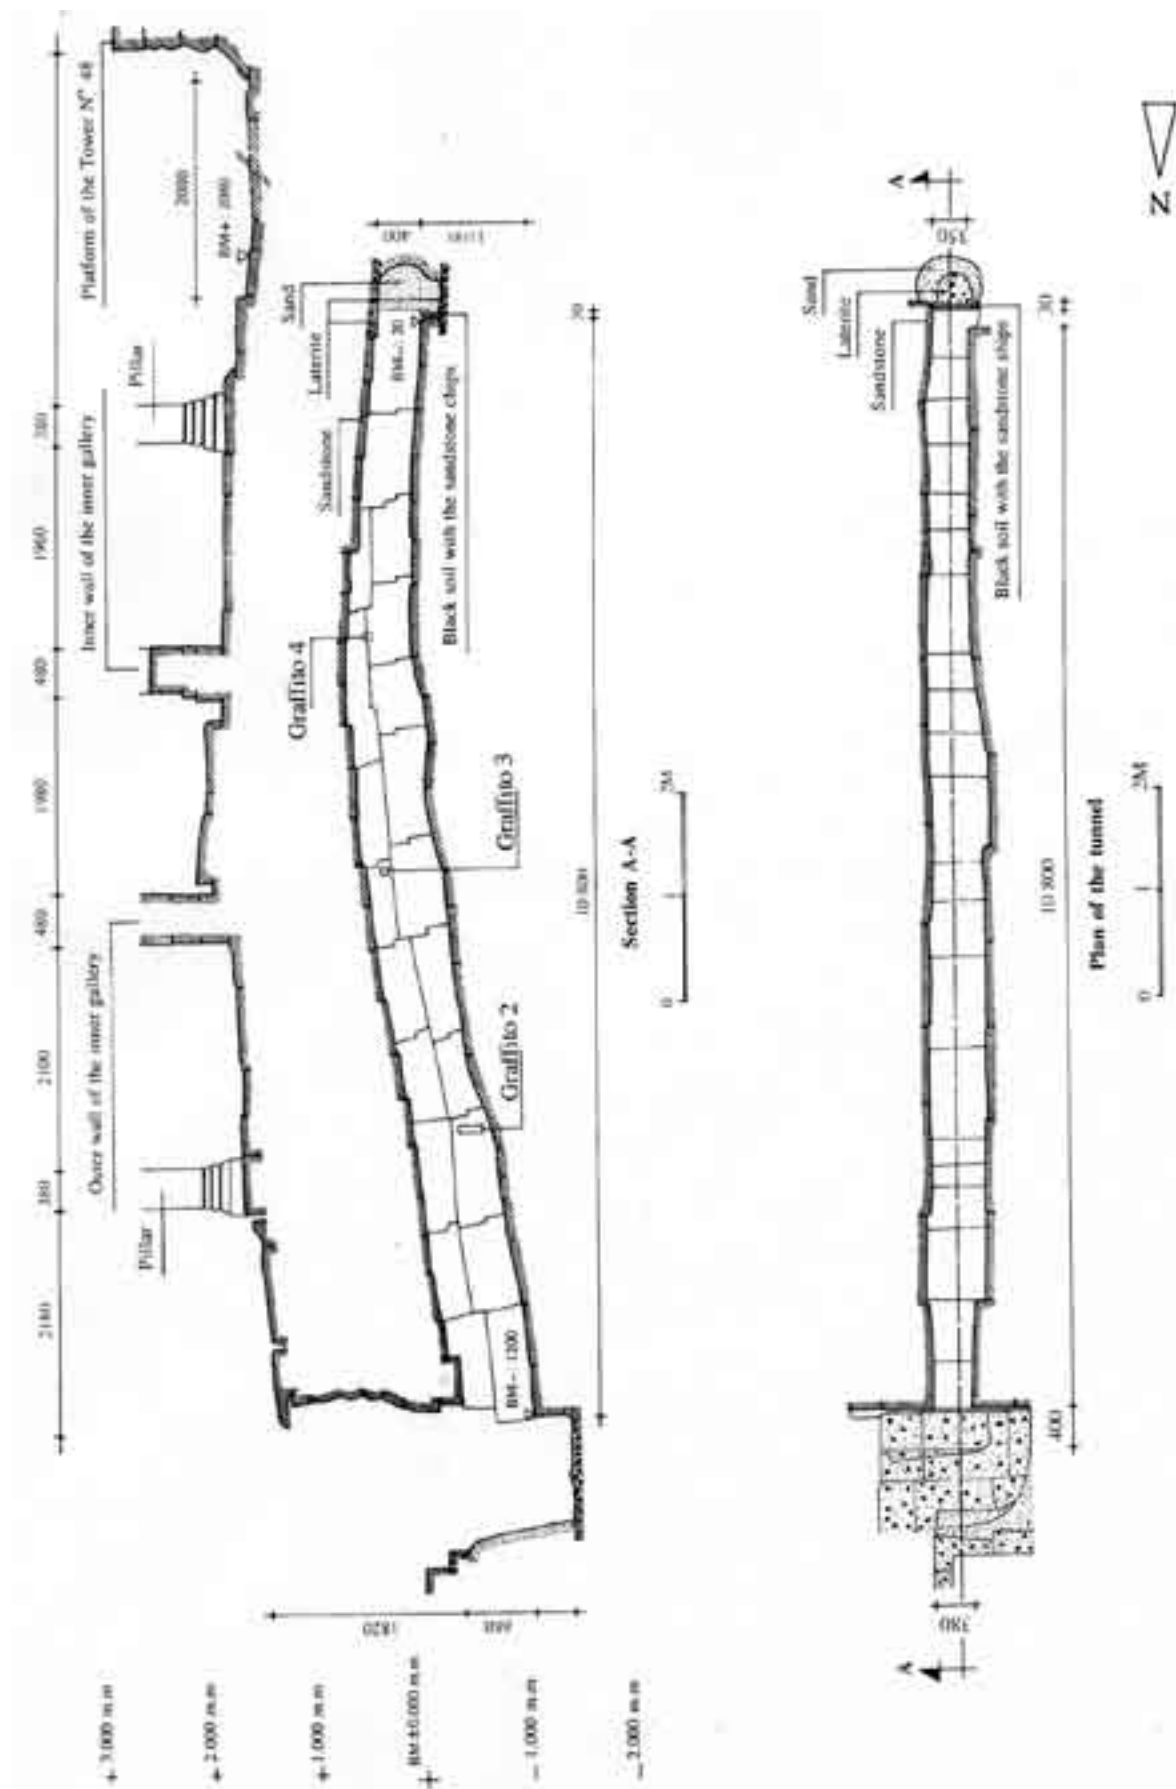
Plan and cross section of tunnel under the Inner Gallery. / 内回廊基壇横穴平面図及断面図.
